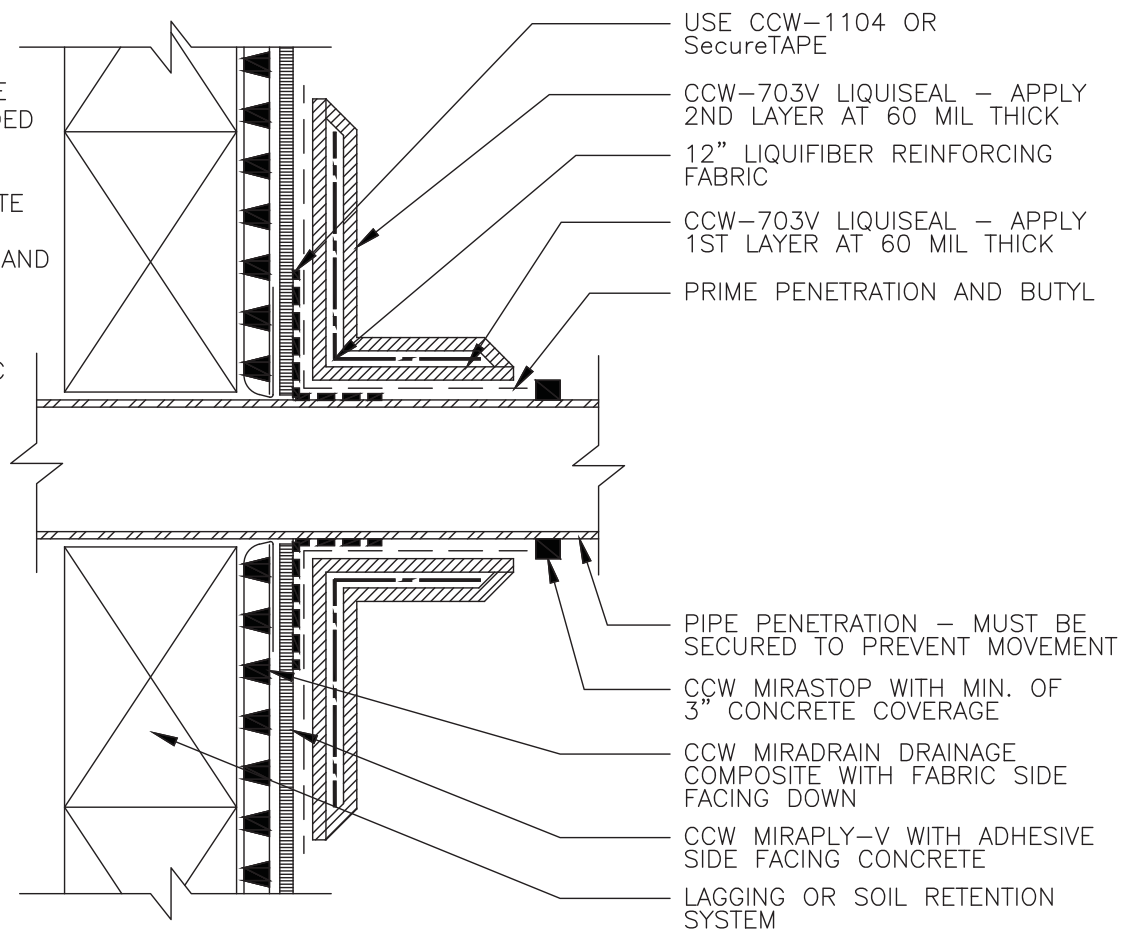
DETAIL IS INTENDED TO BE A GUIDE FOR WATERPROOFING INSTALLATION ONLY.
